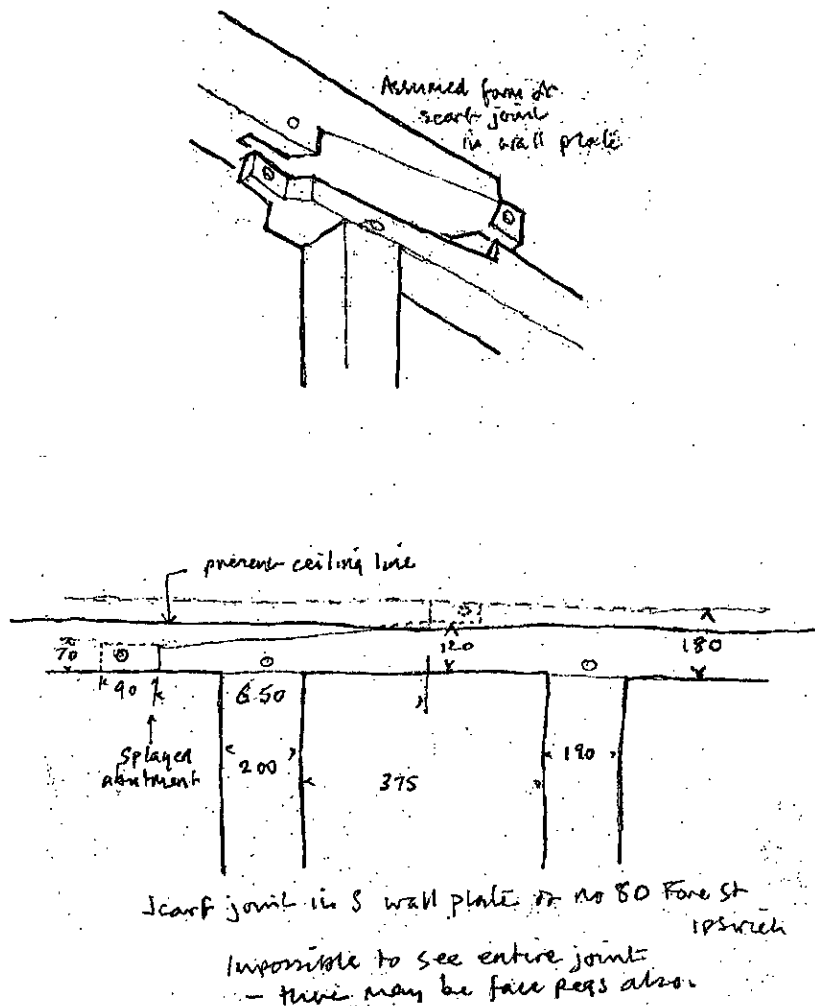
Range 1. Details of scarf joint in rear wall plate (survey drawing)
